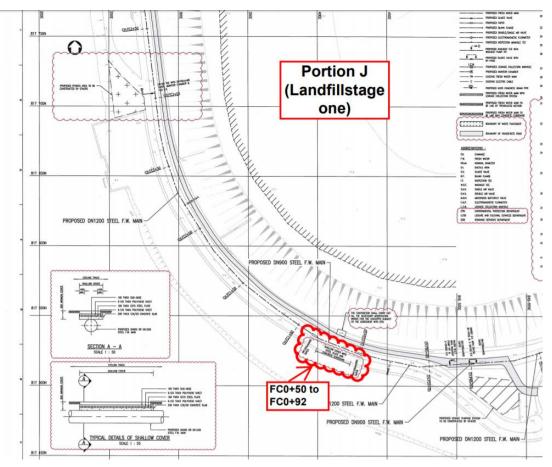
Location Plan – Landfill Stage 1 (Area FC0+50 -FC0+92)
